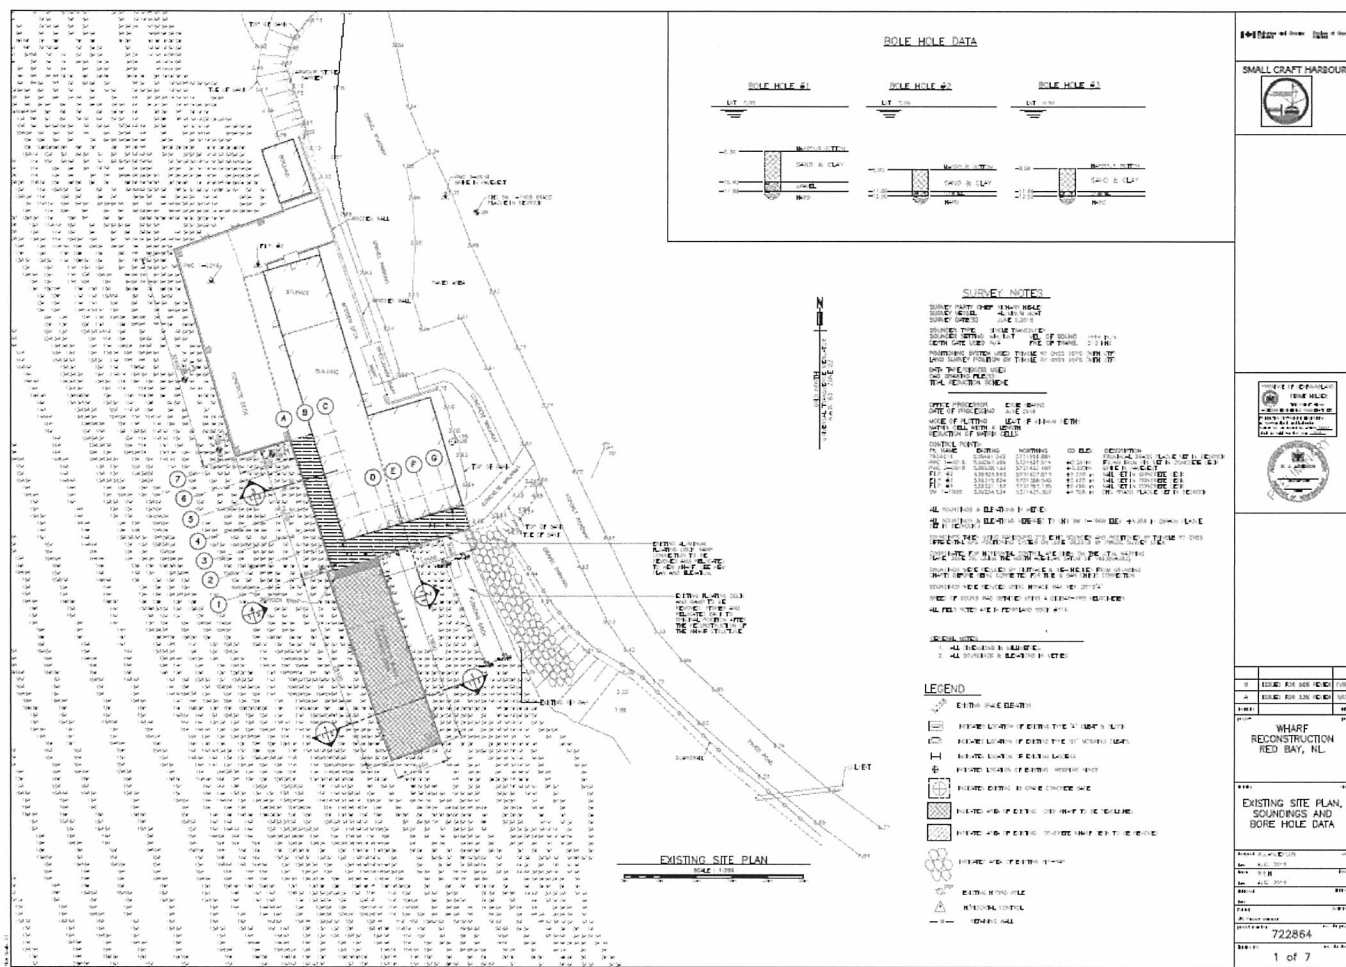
Proposed Wharf Reconstruction, DFO-SCH facility, Red Bay, NL
